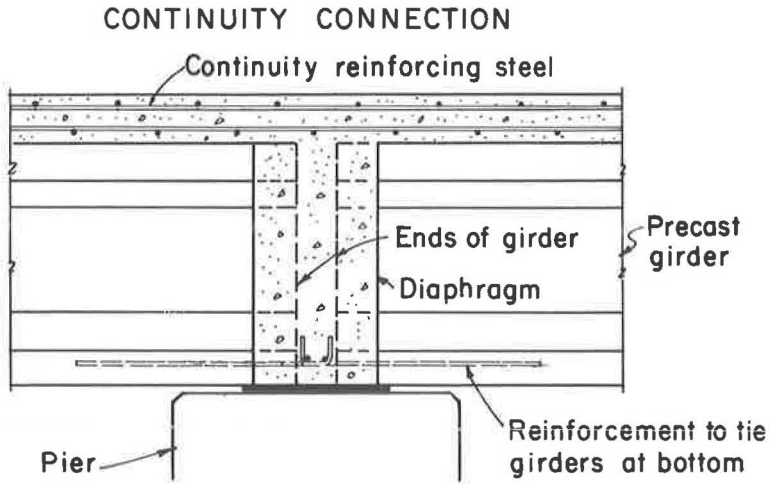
Typical section at pier of precast prestressed concrete bridge made continuous by use of mild steel in deck.
